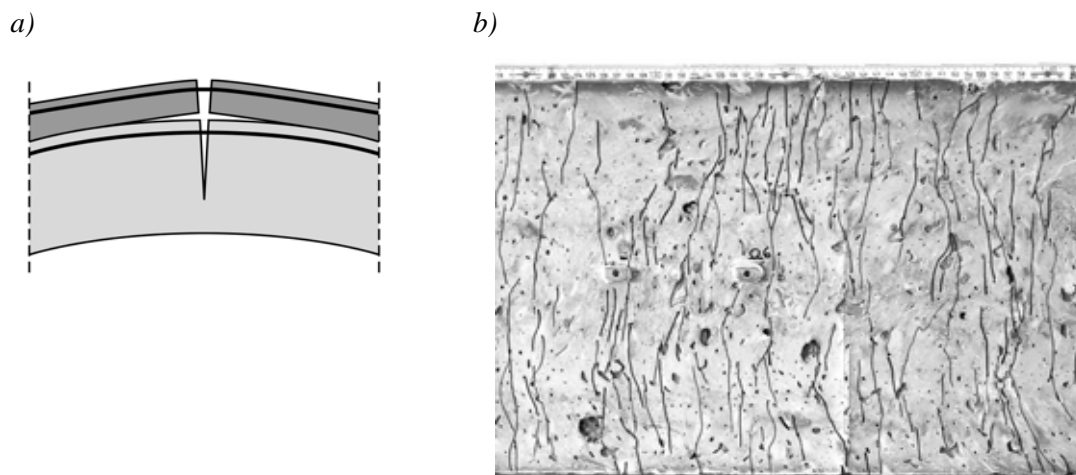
a) Failure principle, b) crack pattern (at the end of the test) of the beams R
